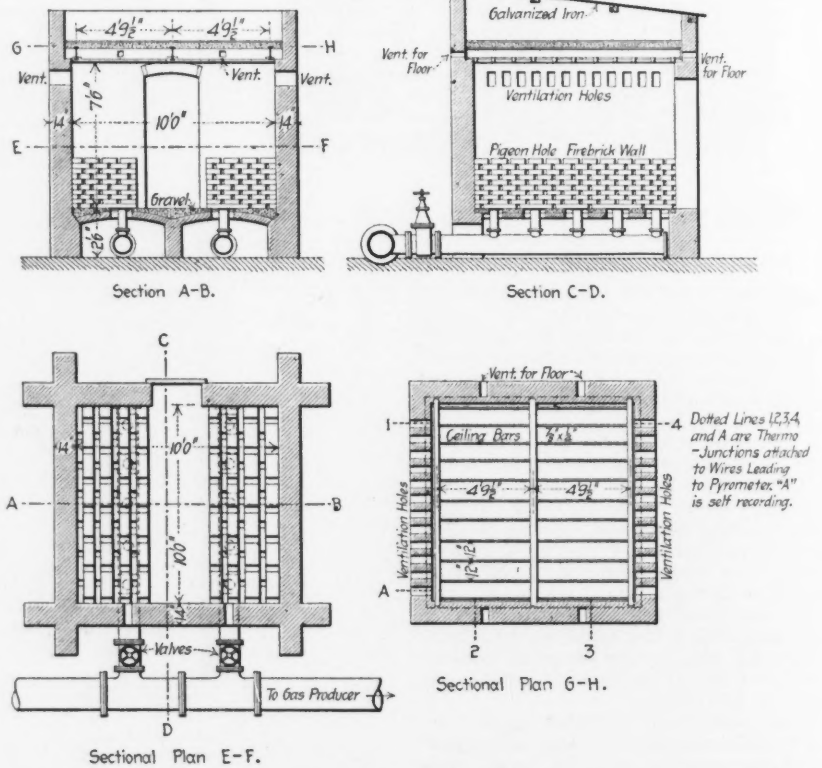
DETAILS OF TESTING-HOUSES OR FURNACES FOR FIRE TESTS OF DOOR AND CEILING CONSTRUCTIONS.
